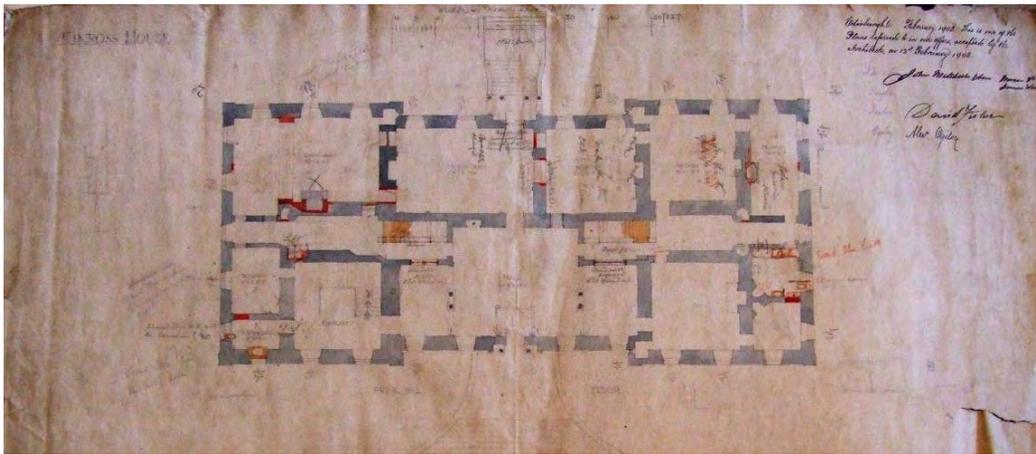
Kinross House entrance storey plan. MacGibbon & Ross, 1906. *Kinross House
